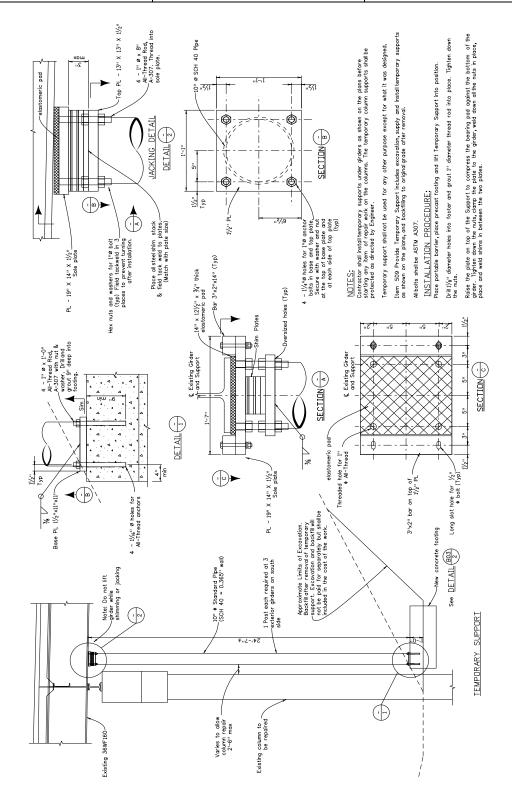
(I)-4 Sample Details for Falsework to Support a Steel Girder
